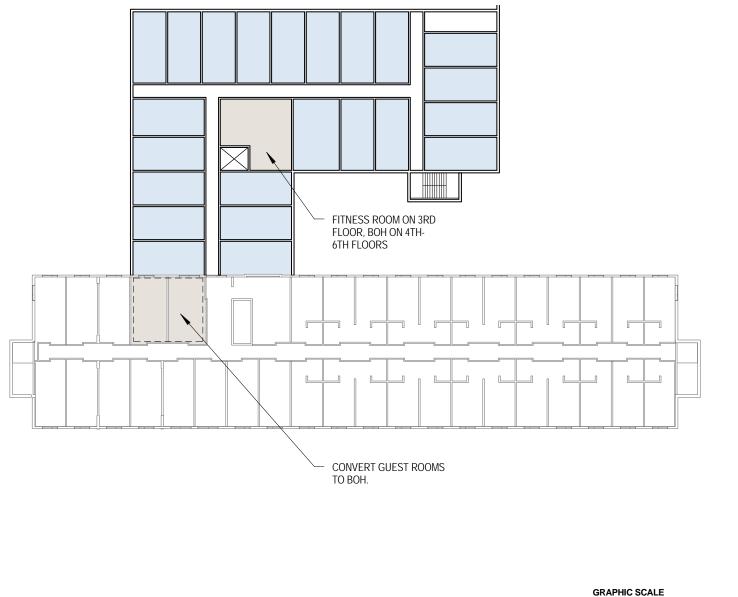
Typical Upper Floor Plan Source: Arrowstreet, 2014
